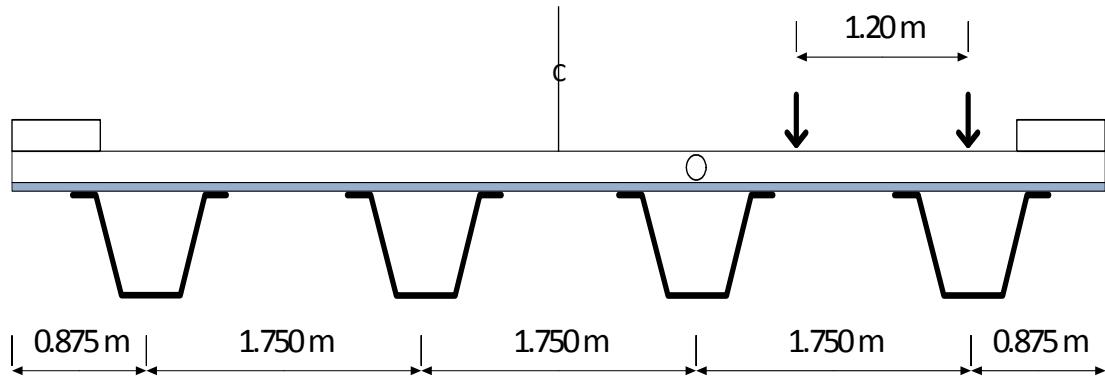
Arrangement of loads and hinge to calculate load distribution factor for external girders
